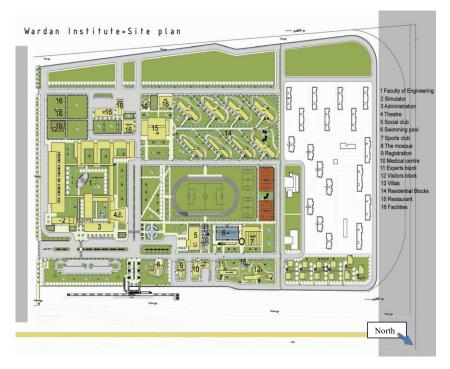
Wardan institute master plan "scale 1/5000" (Abou-Gad, 2008)
